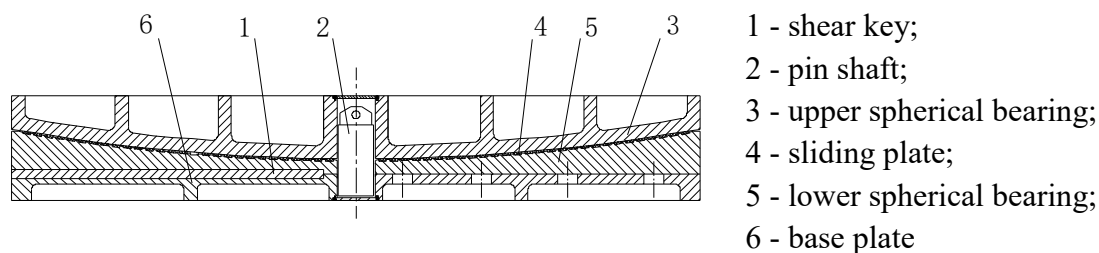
Schematic diagram of the structure of the rotating steel spherical bearing at the bottom of the cast and formed pier
